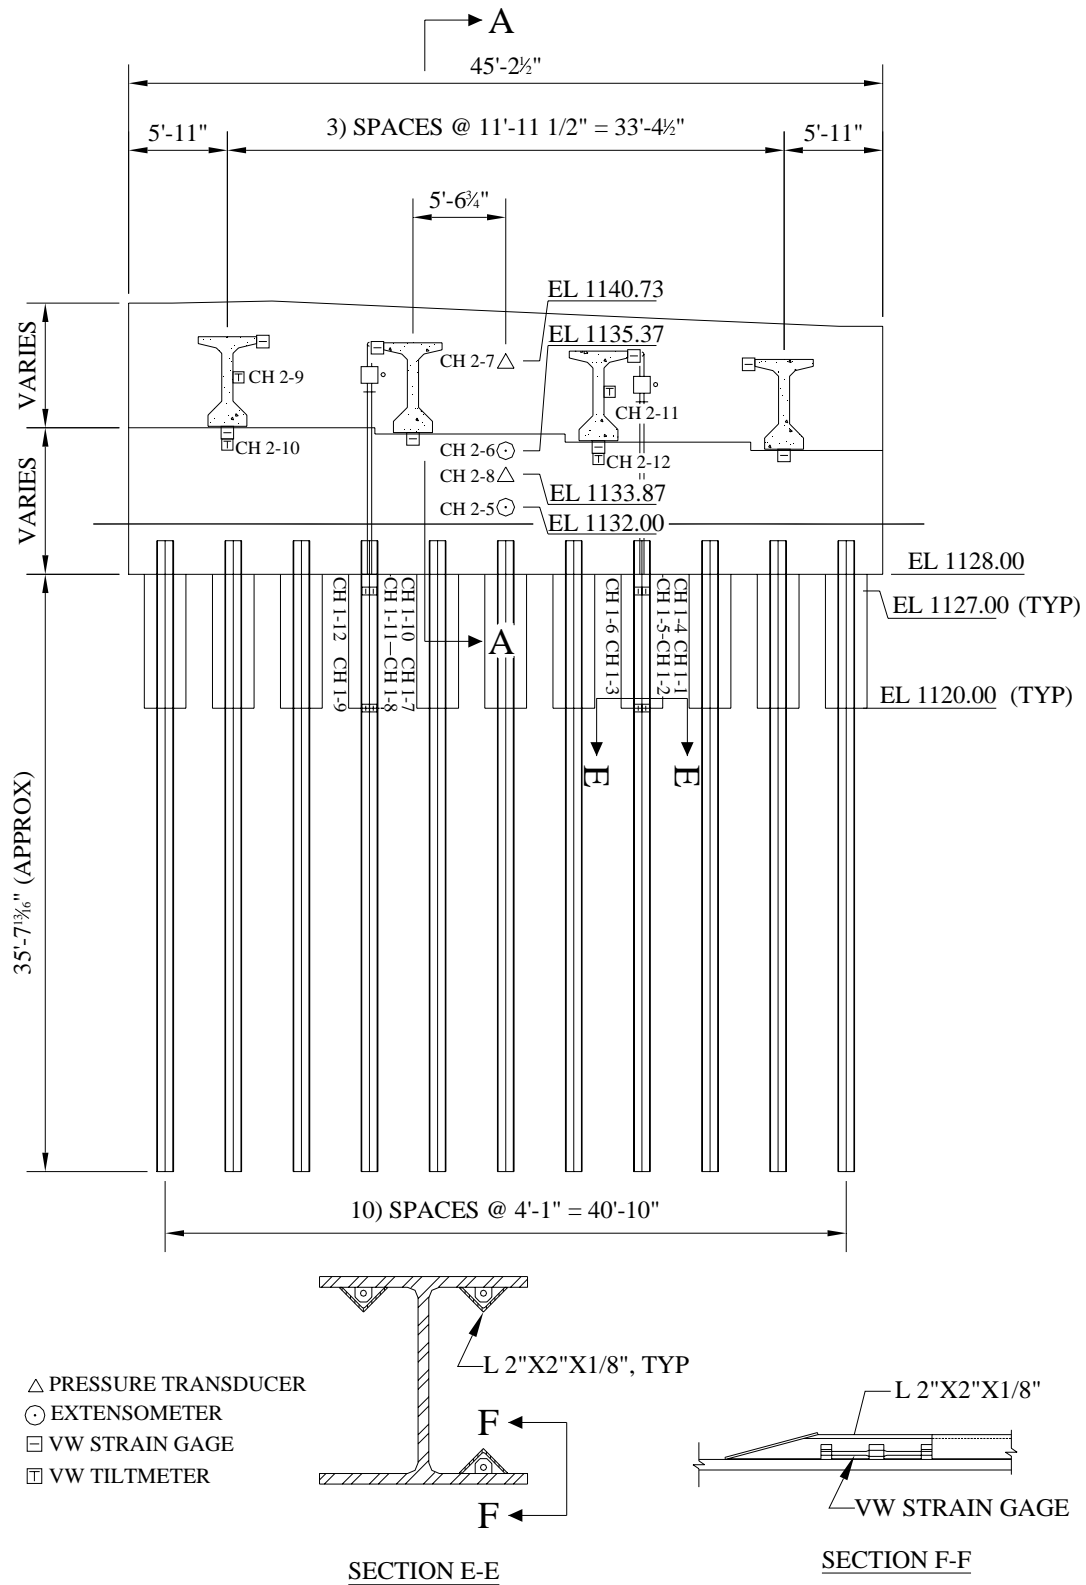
Structure 211 Abutment 2 Elevation (Section B-B).
